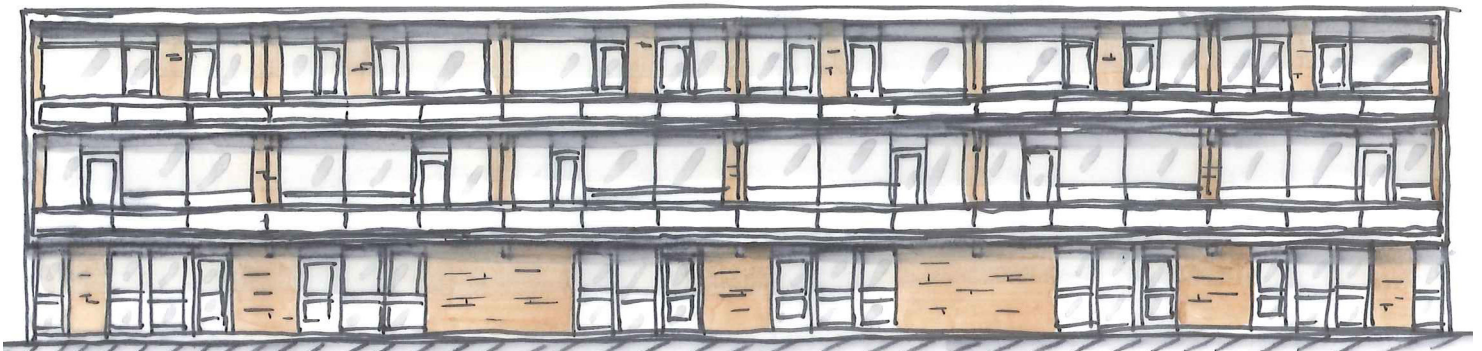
Original south facade of the terraced houses in Vrieheide. The ground floor is made as brick masonry cavity wall. The first and second floor have balconies and the facade is made of brick masonry walls and wooden framed elements with panels and glass. (own ill.)
